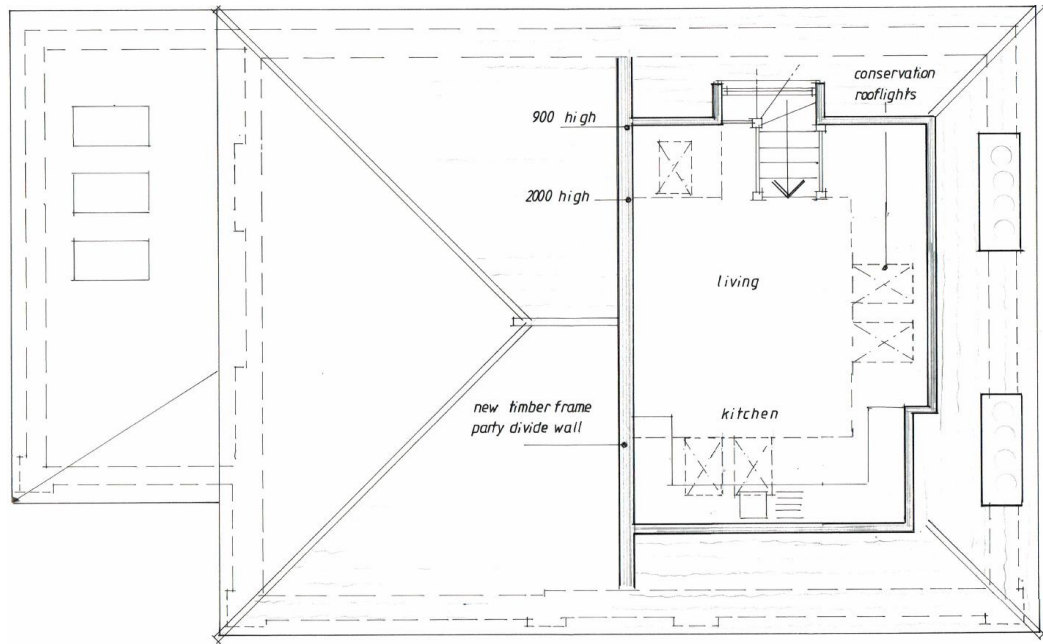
2018 approved and implementable roof plan arrangement. Source: Allen Smith Associates.
